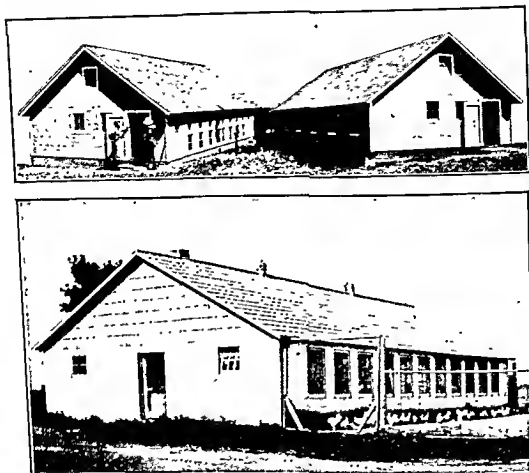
Top, a 20-by-40-ft. straw-loft laying house, showing front and rear views. Note the arrangement of windows in front, ends, and rear. (*Hoard's Dairyman*.) Bottom, a masonry straw-loft laying house in Illinois, the walls of which are made of 8-in. lightweight concrete blocks. The roof is made of asbestos shingles, and the walls are painted with a white portland-cement paint. (*Poultry Tribune*.)
